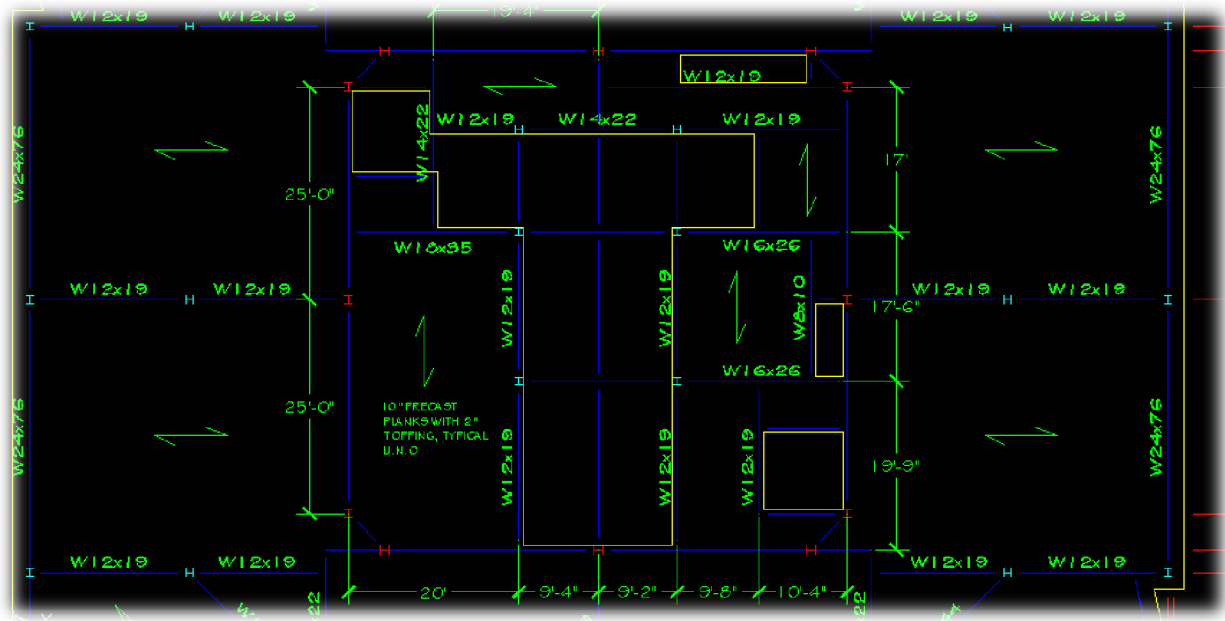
Typical Core Steel Frame and Plank Framing Plan
